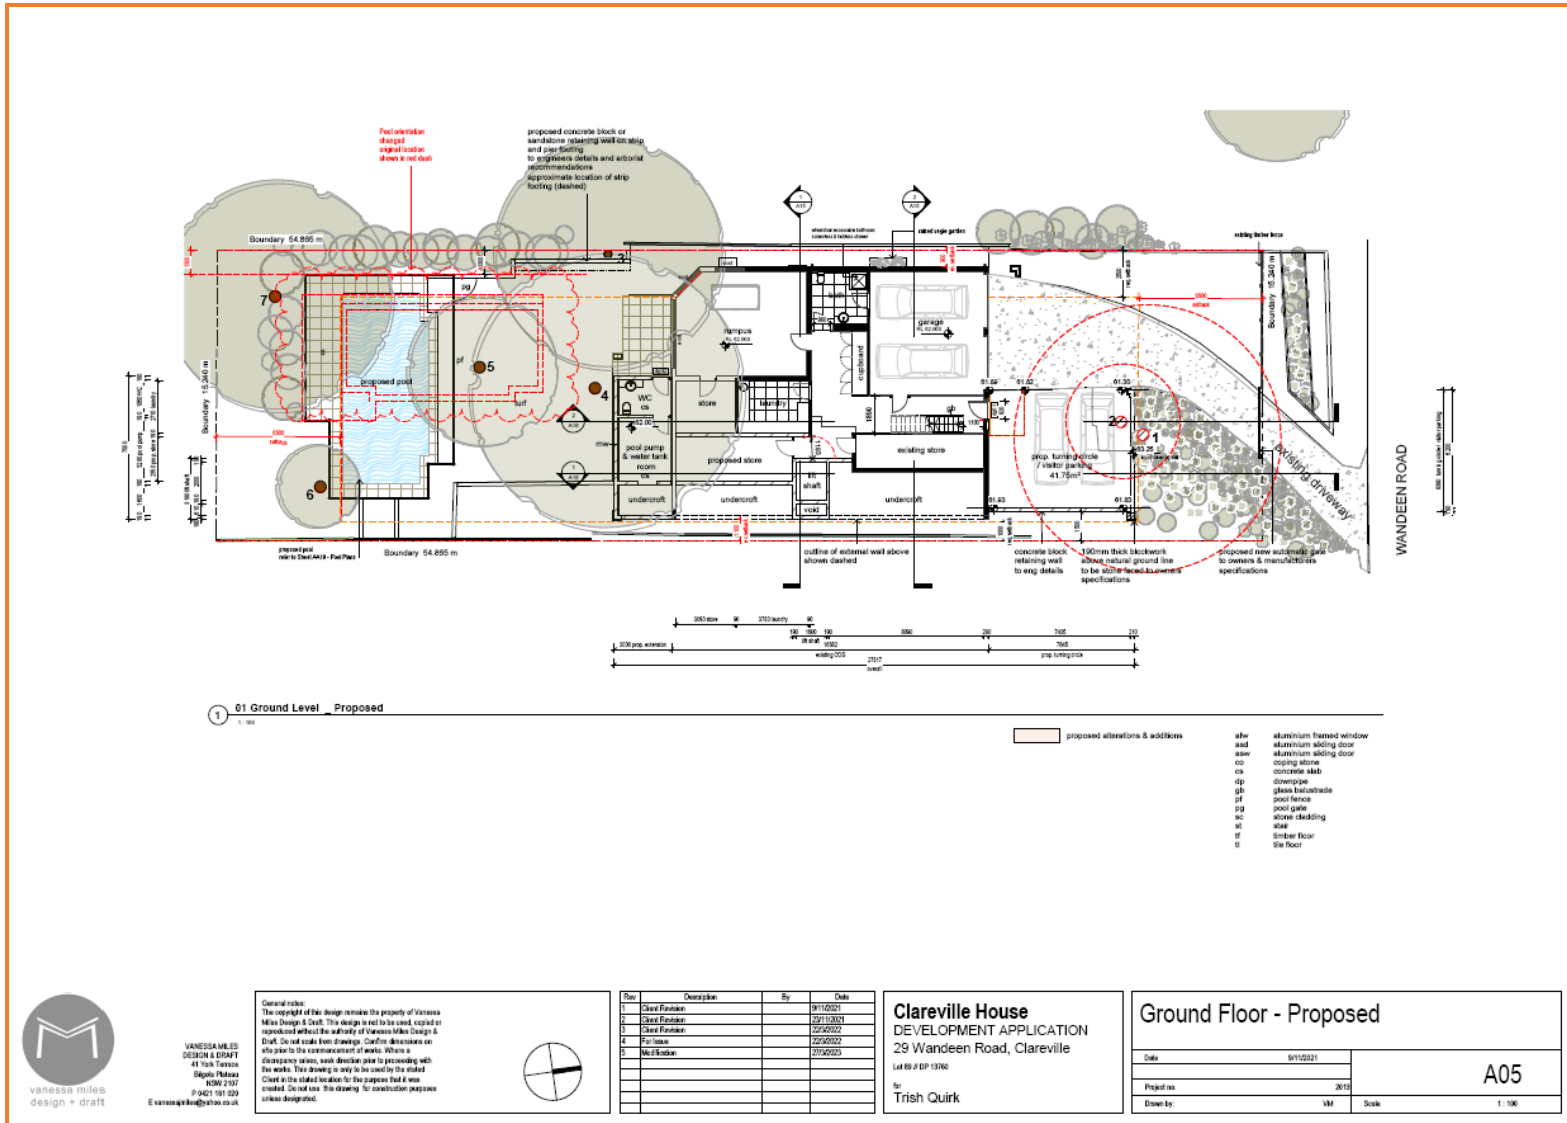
Previous & above illustrates the as proposed Site Plan & Ground Floor Plan.
